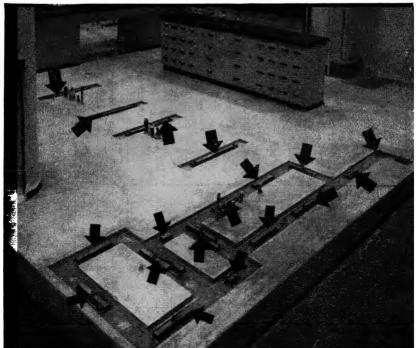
Arrows indicate rubber mountings that prevented vibrations originating in laboratory equipment from reaching structure of an office building.
